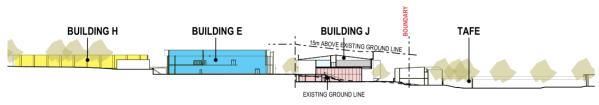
Proposed streetscape elevation and building section, view from Showground Road (southern elevation) Source: Lahznimmo Architects
